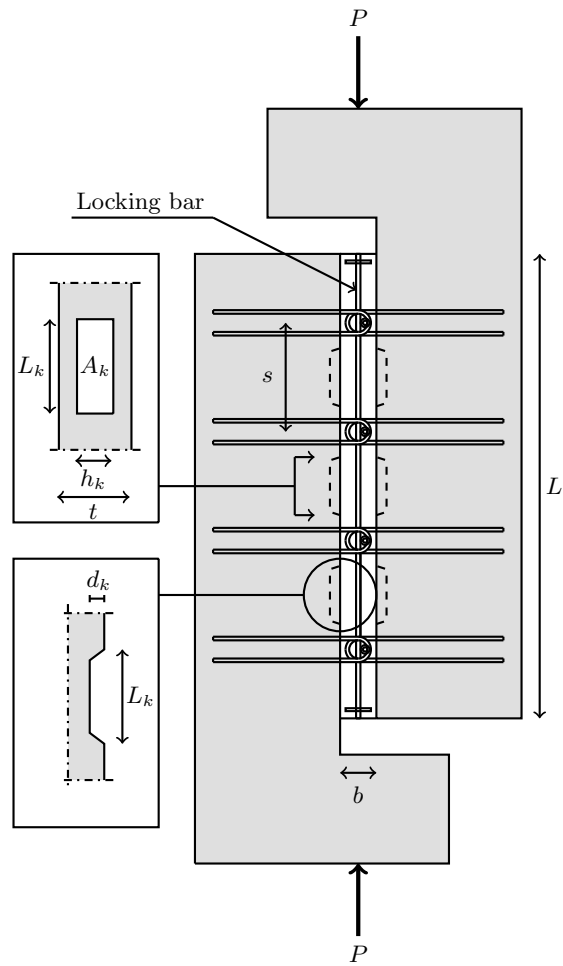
General layout of push-off test specimens, thickness equals 200 mm (reinforcement in precast element not shown)
